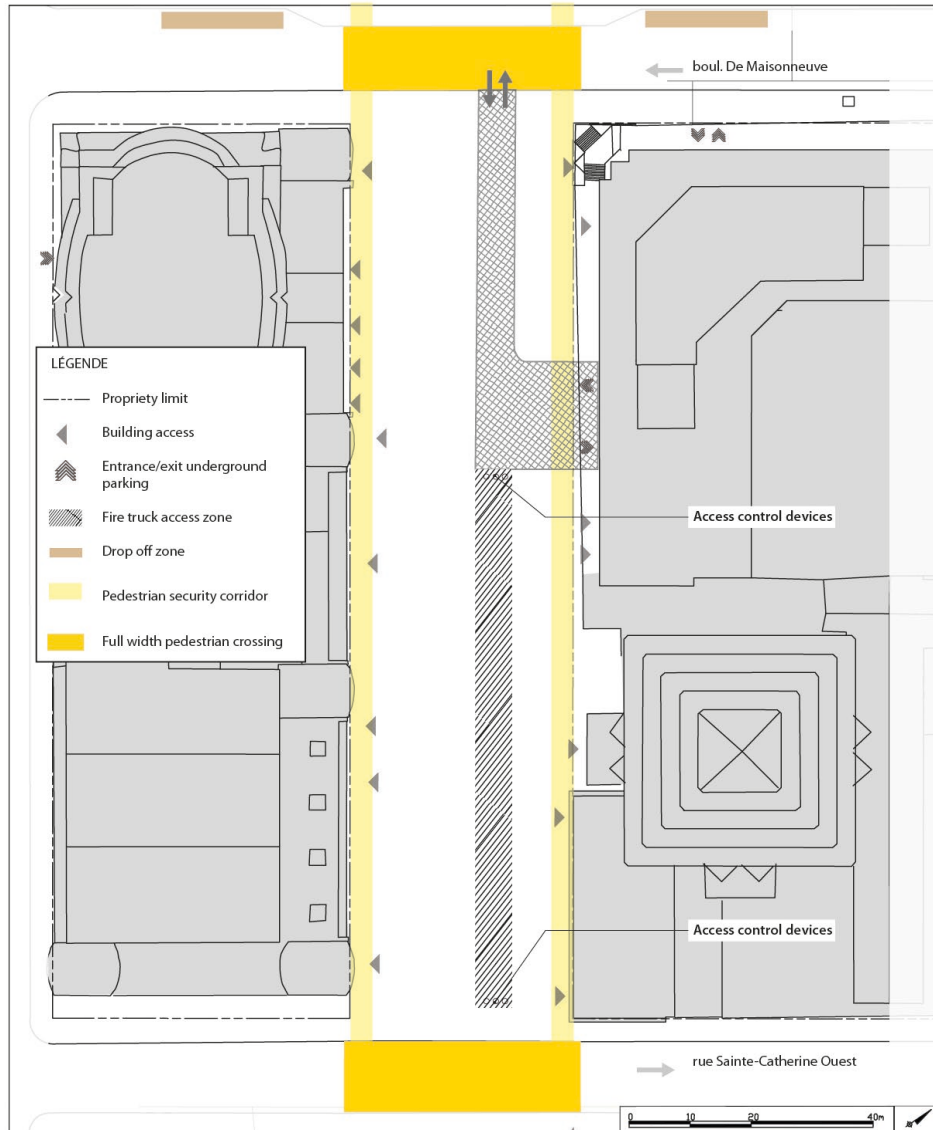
Diagram showing the spatial planning constraints relating to vehicular access to the Eaton Centre parking garage. (source: Groupe Rousseau-Lefebvre, 2019)
